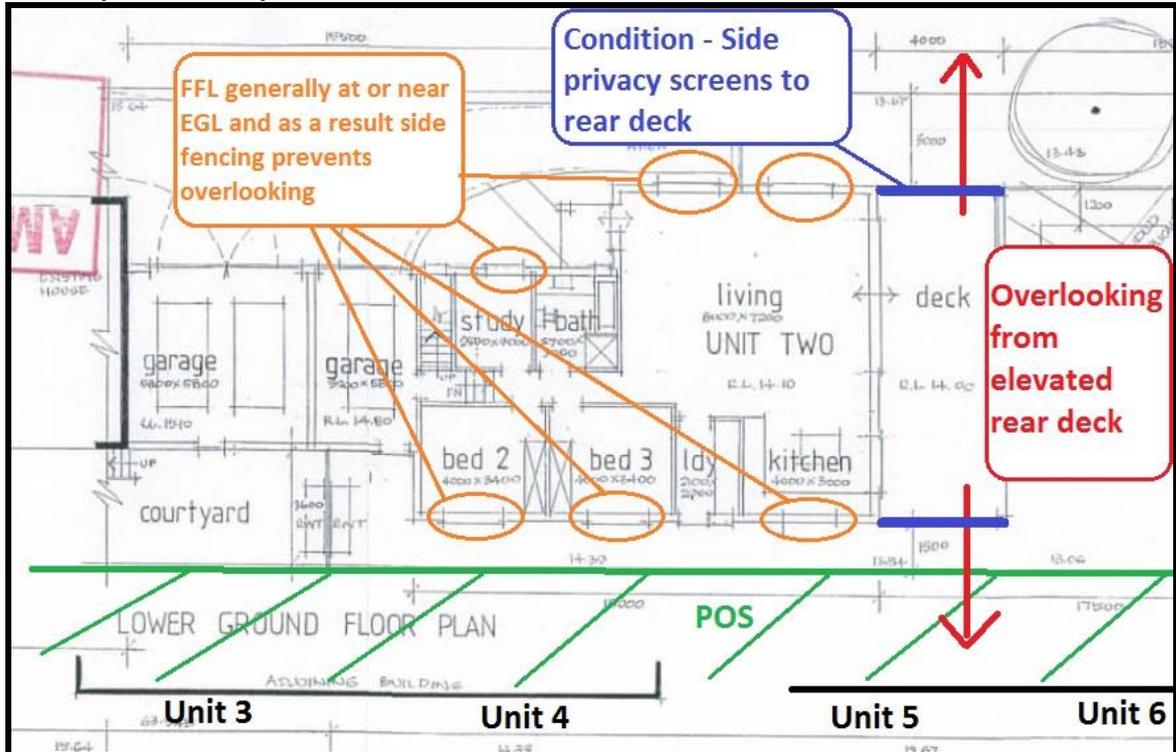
Lower ground floor plan diagram indicating that side fencing prevents overlooking from the windows circled in orange. Shown with red arrows is the potential for overlooking from the elevated rear deck to the properties to the north and south. It is recommended that a condition be imposed requiring privacy screens to the sides of the deck (position marked in blue) and also a highlight window to the kitchen to prevent this potential overlooking.
